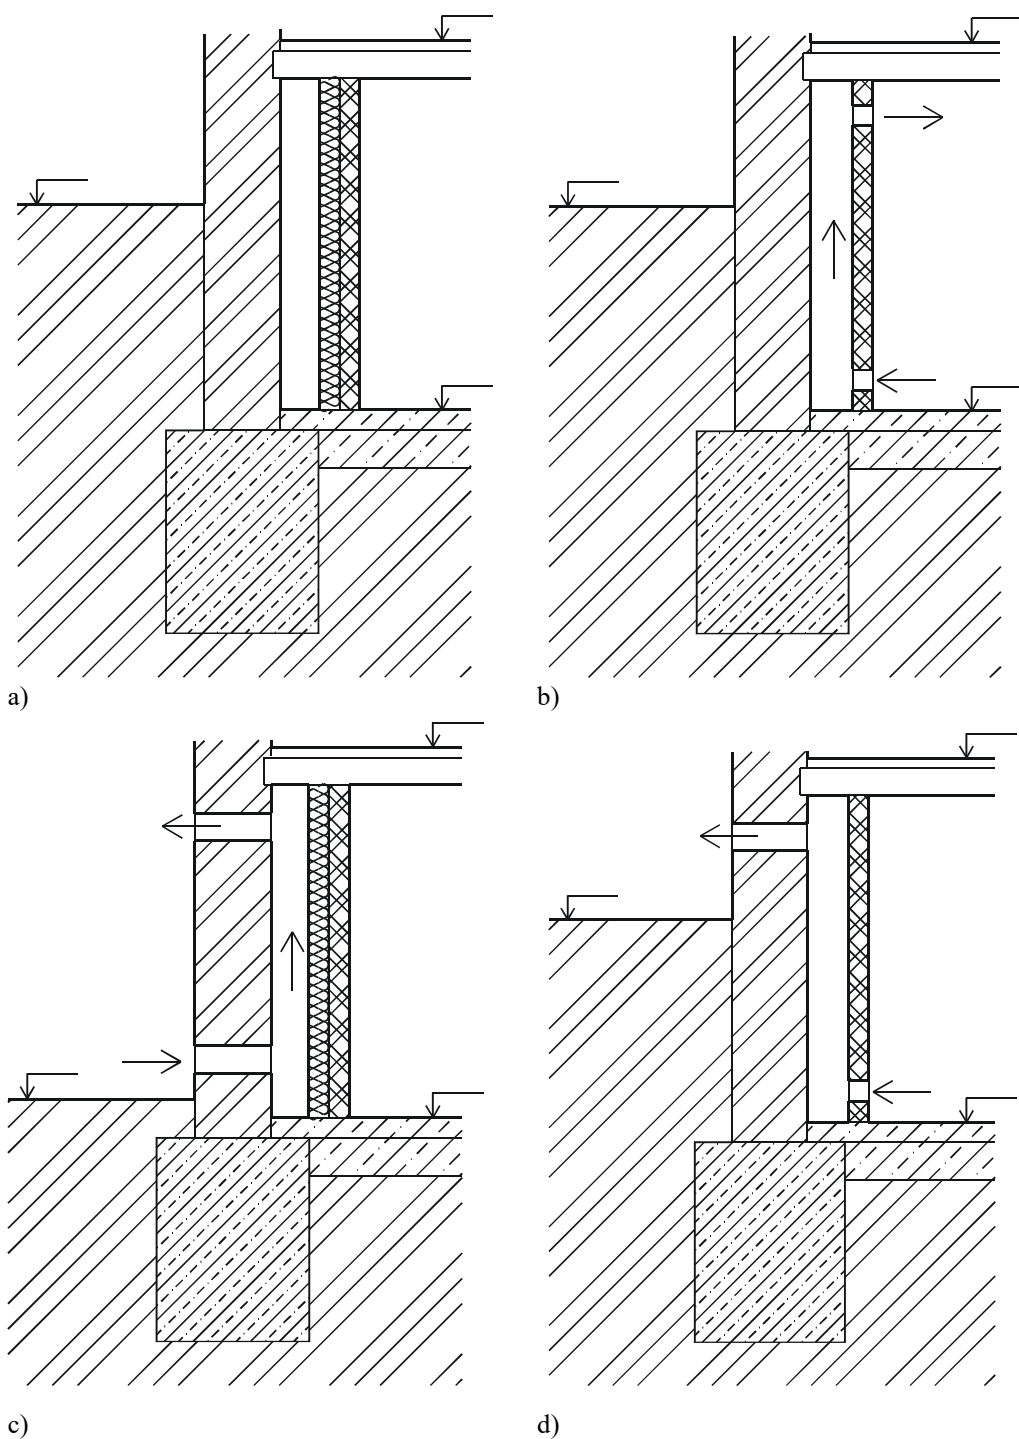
Air cavities in offsetting walls on the inside of the moist wall above the floor level
